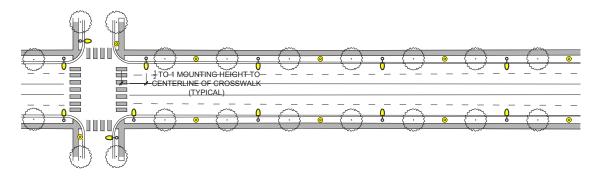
Typical Collector Street with Continuous Street and Non-Continuous Pedestrian Lighting Plan
